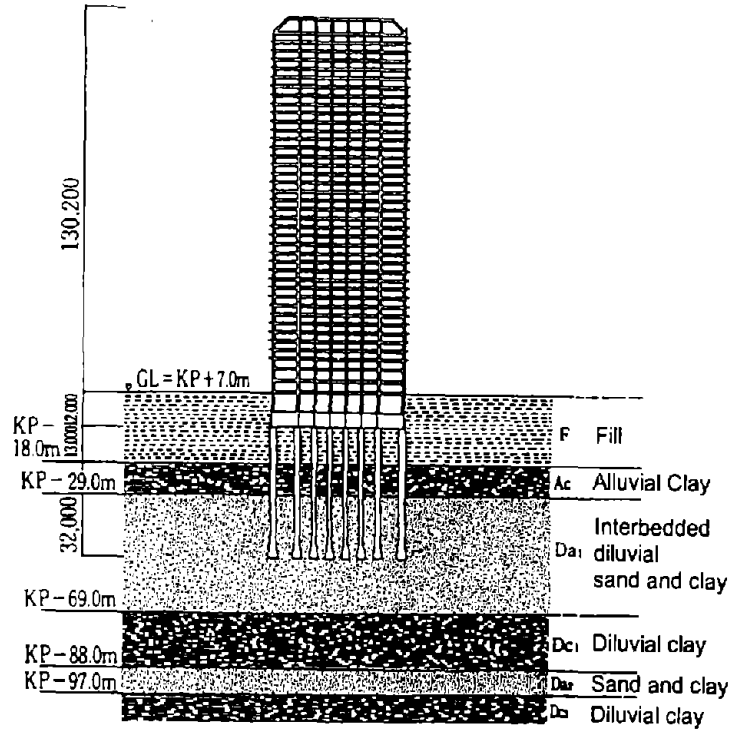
Foundation conditions under a high rise building on Rokko Island.
